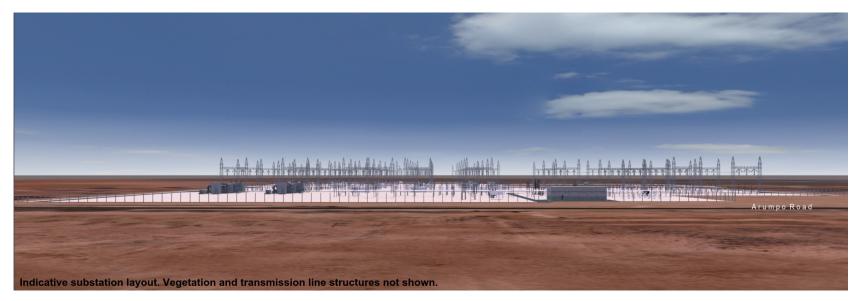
Indicative elevation of the proposed substation, facing Arumpo Road (south-east elevation)
